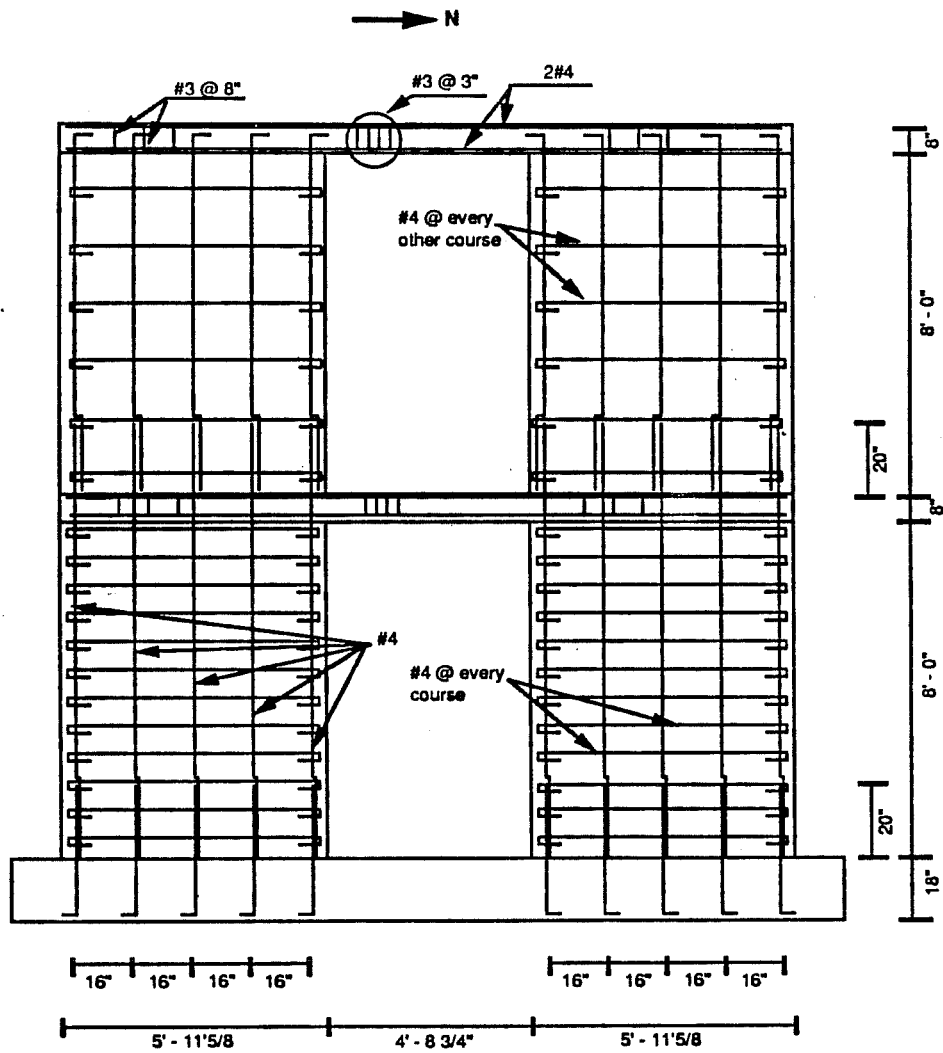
Specimen 2a and 2b Wall Reinforcement
